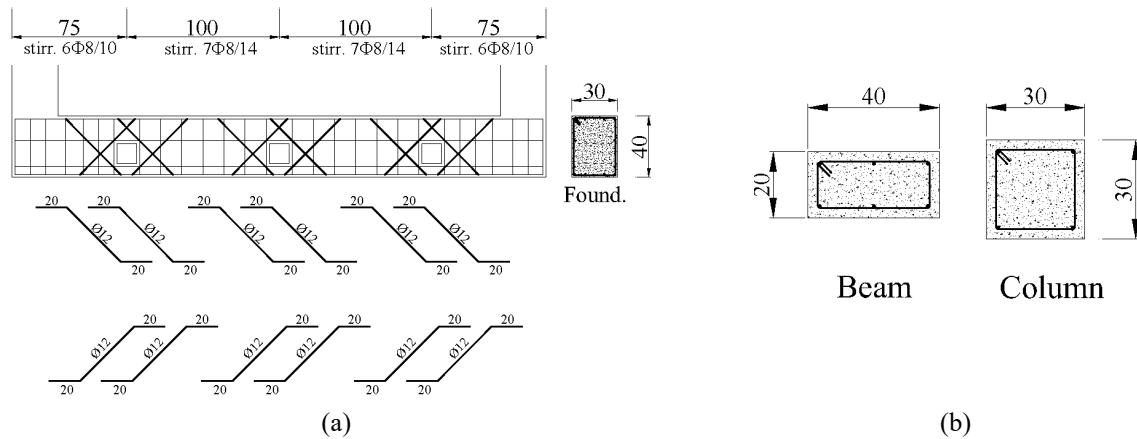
Reinforcement in the foundation beams (a) and cross sections of frame's structural elements.
